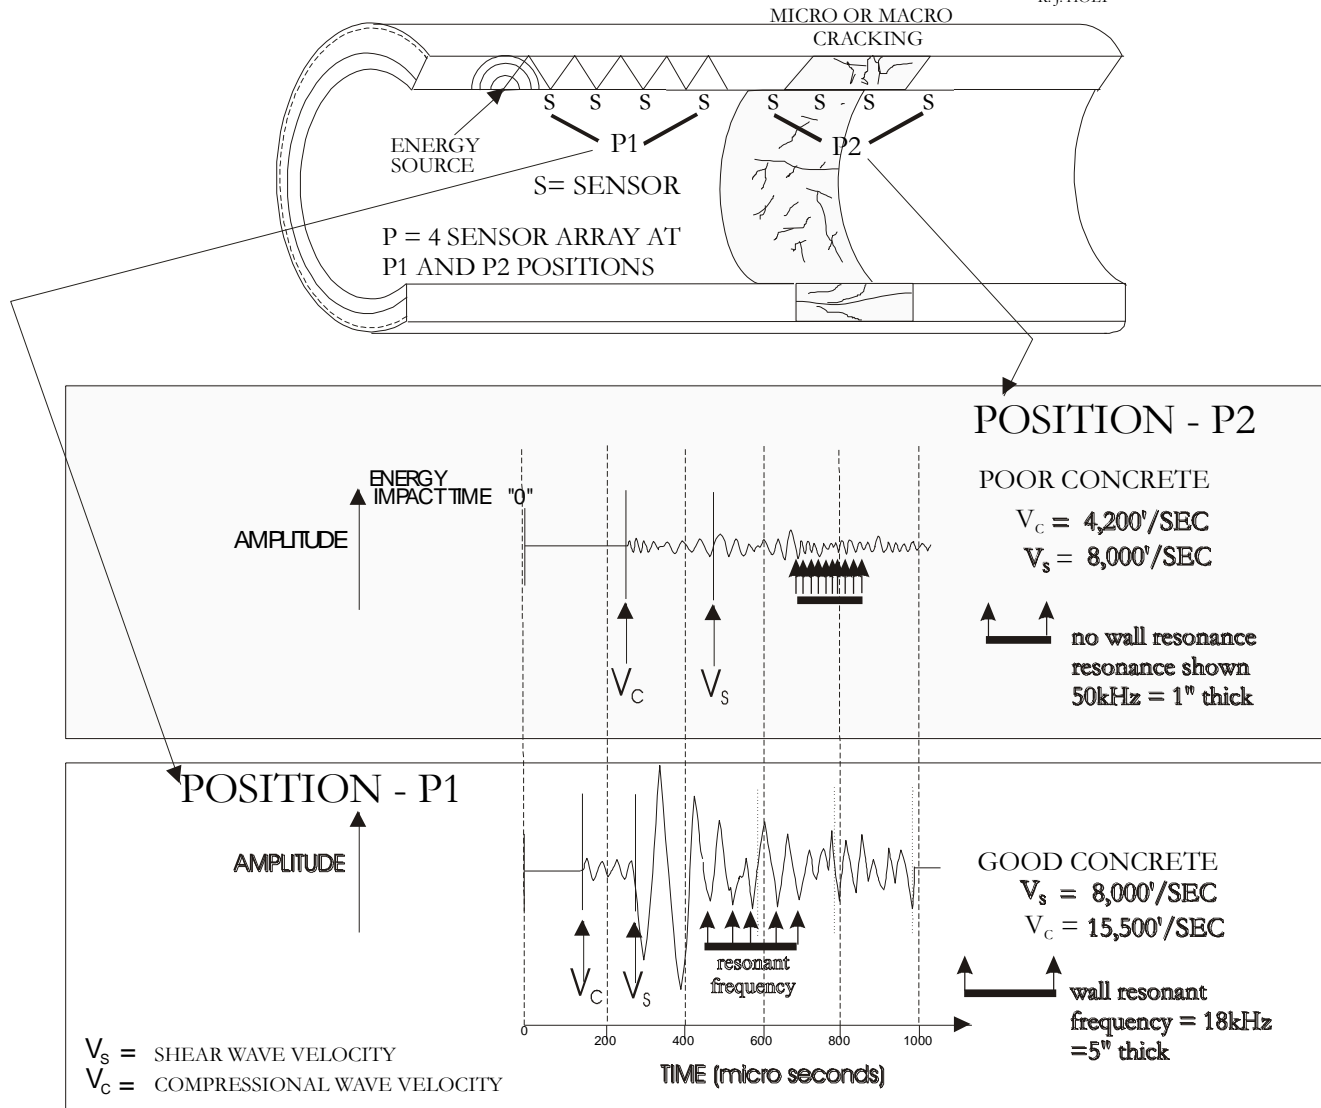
is illustrative of a tunnel liner or pipe investigation where there has been circumferential damage, perhaps at a construction joint or an outside zone of weakness (rock shear or fault, soil washout etc.) that has affected the integrity of the liner. The damage need not be visible; there can be a 20% reduction in the strength of the concrete from micro-cracking that is not visible to the naked eye. The process of deterioration of most concrete starts at the micro level and with continued stress the micro cracks coalesce into macro cracks and finally to spalling. The ability to measure at the micro level well in advance of future needed repairs provides a management tool for establishing priorities for repair, projected budgets, and asset valuation
